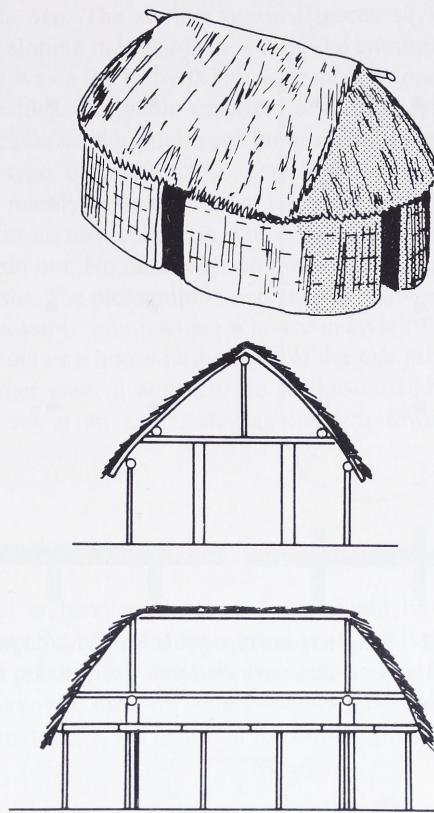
Tongan house types: *fale fakamanuka*. Axiometric view, transverse and longitudinal cross-sections.
